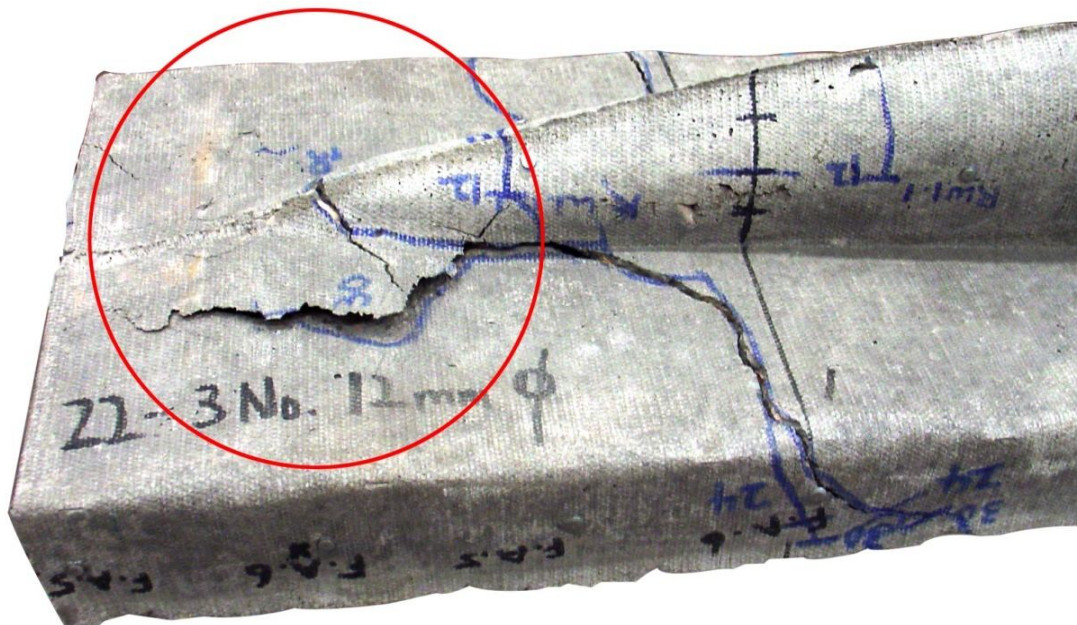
Crack showing the rebar pulling out the anchorage due to the separation of web and flange
